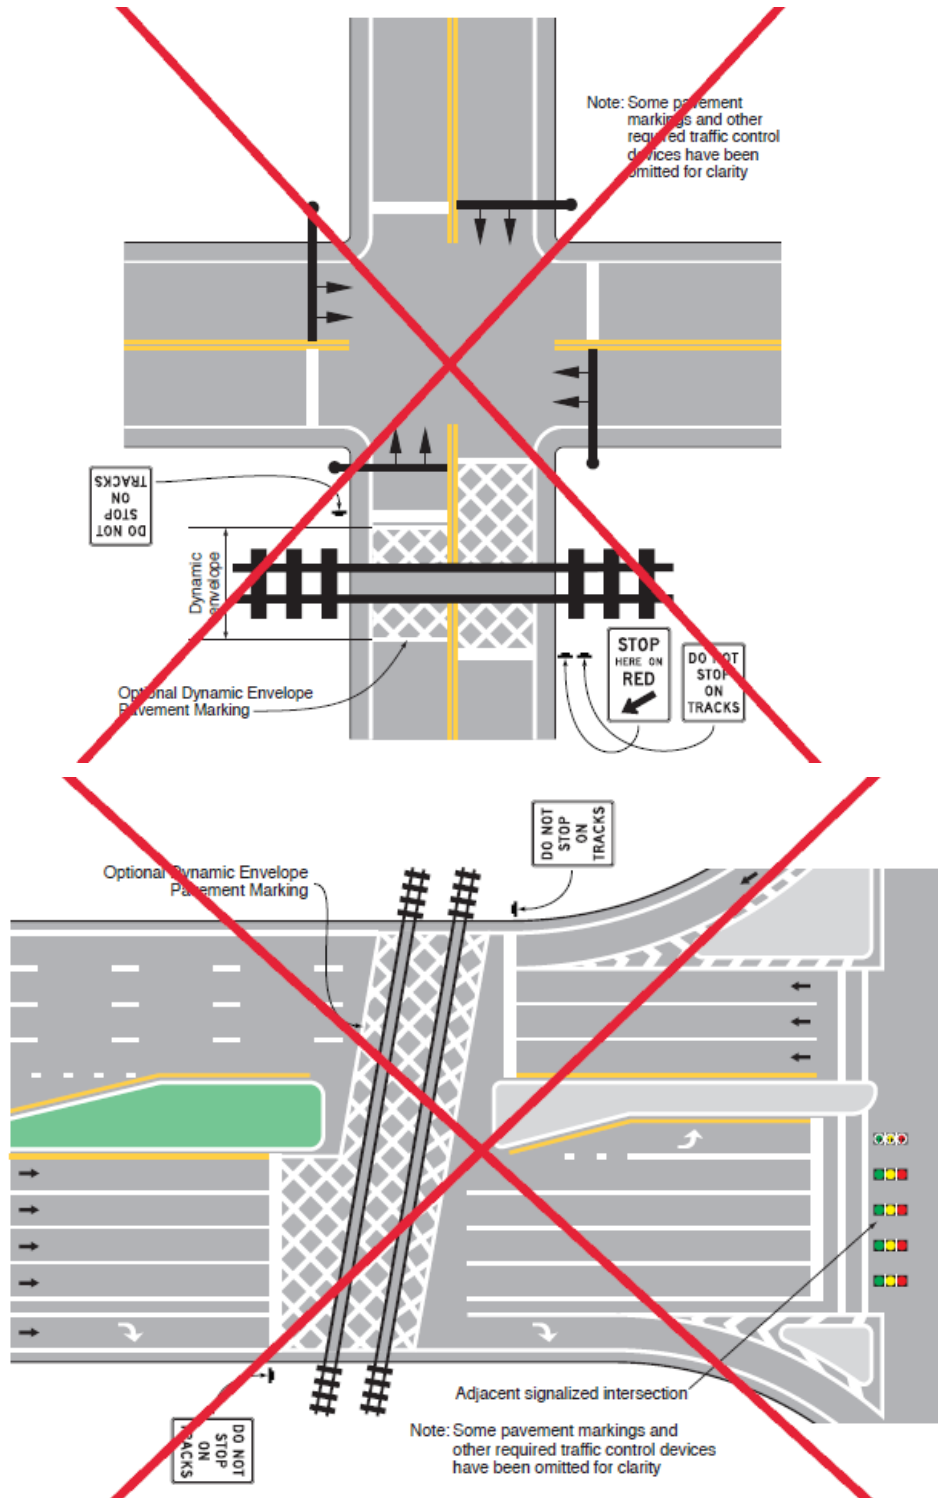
C-3. Example of Dynamic Envelope Pavement Markings at Grade Crossings
